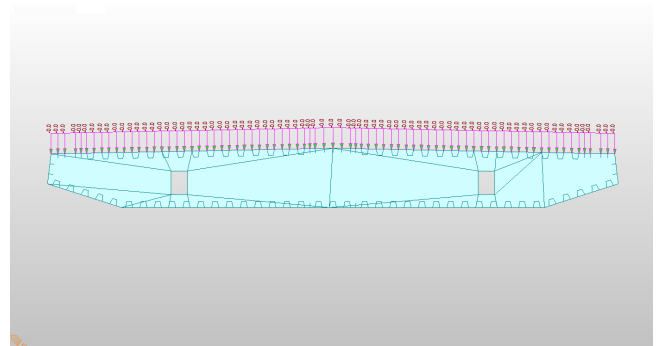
The cross-sectional shape and load of modeling not applied pavement stiffness
